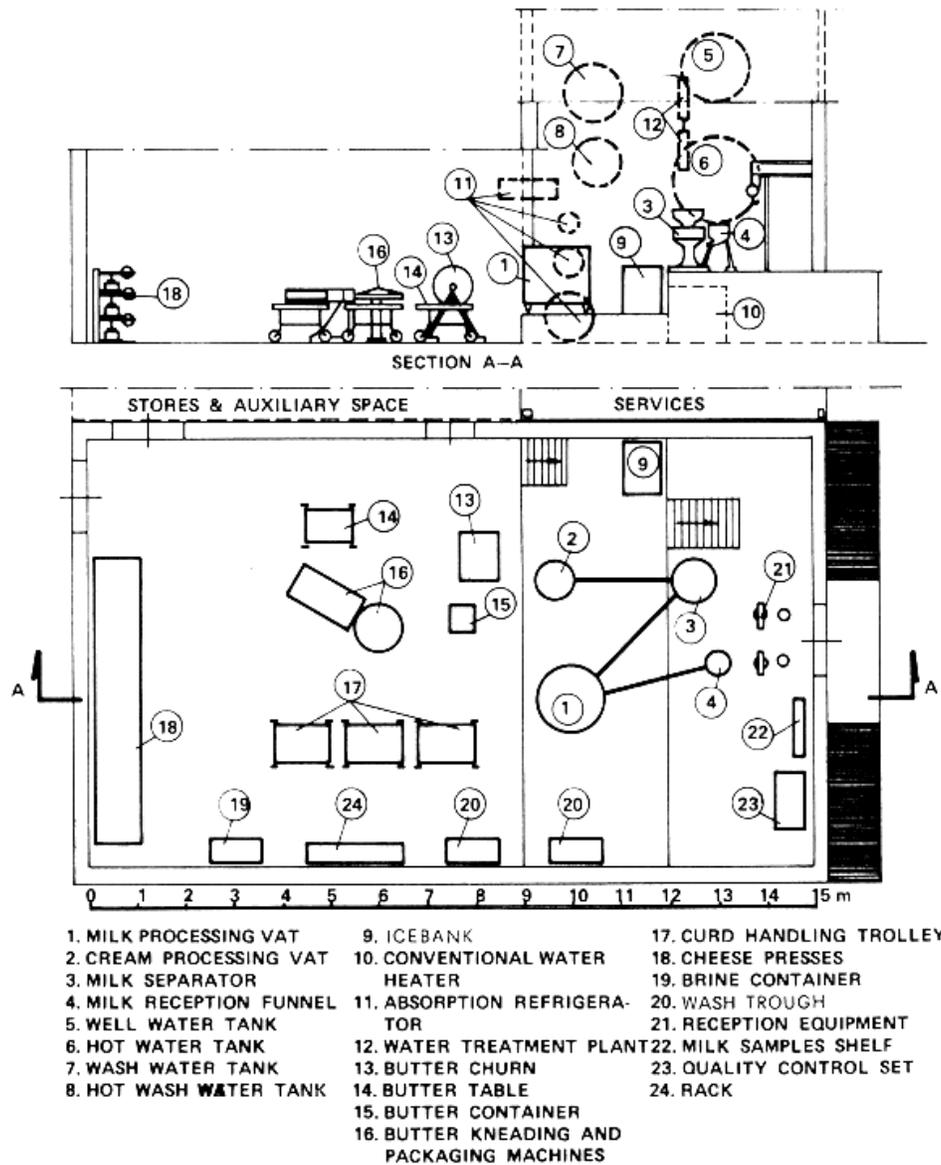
CHEESE AND BUTTER MANUFACTURE 630 l/day TO 1600 l/day FRESH MILK INTAKE. - EQUIPMENT SHOWN FOR 1600 l/day.
